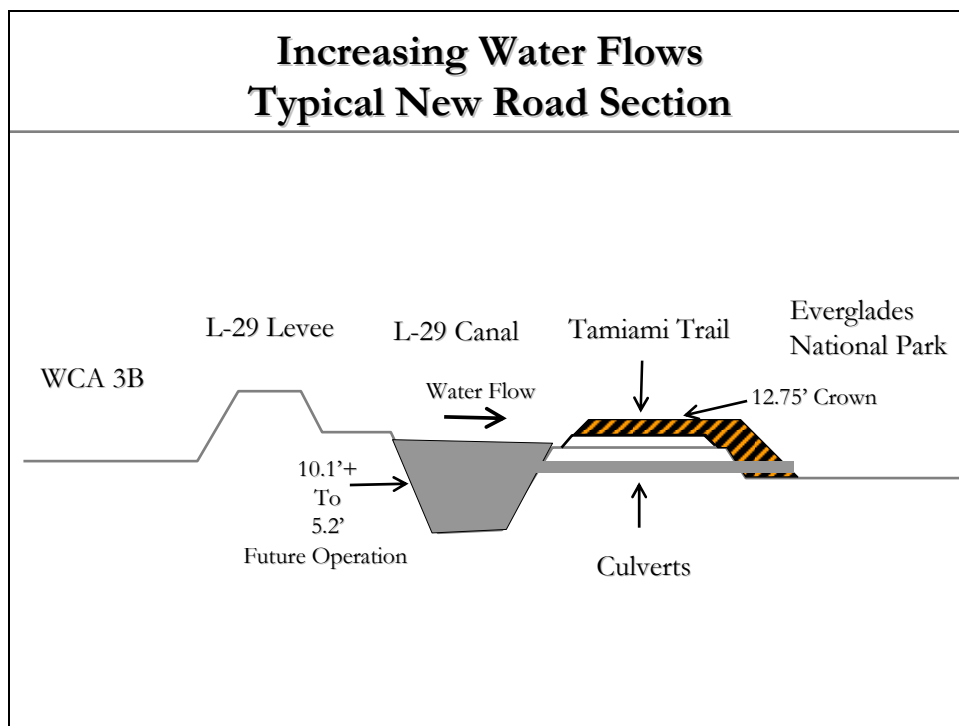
NEW ROAD SECTION FOR THE 2005 RGRR RECOMMENDED PLAN
